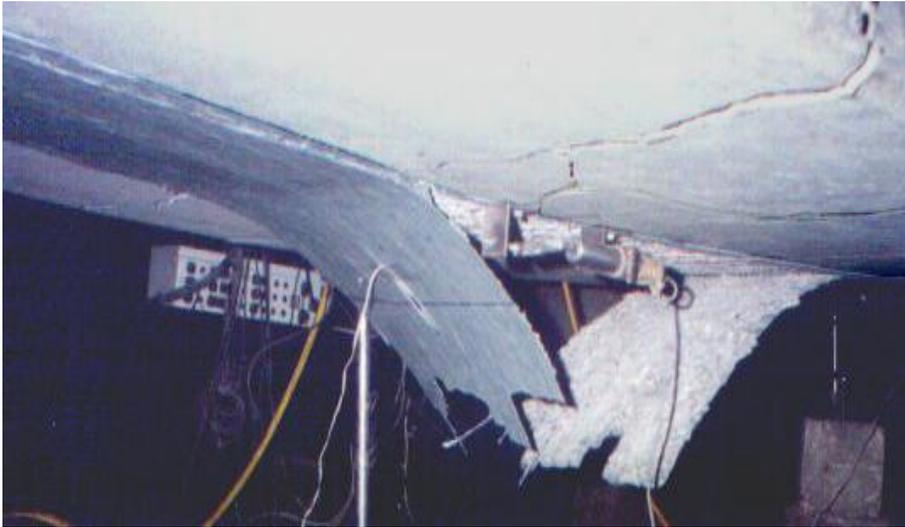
Failure Modes of slabs strengthened with CFRP Sheets.
